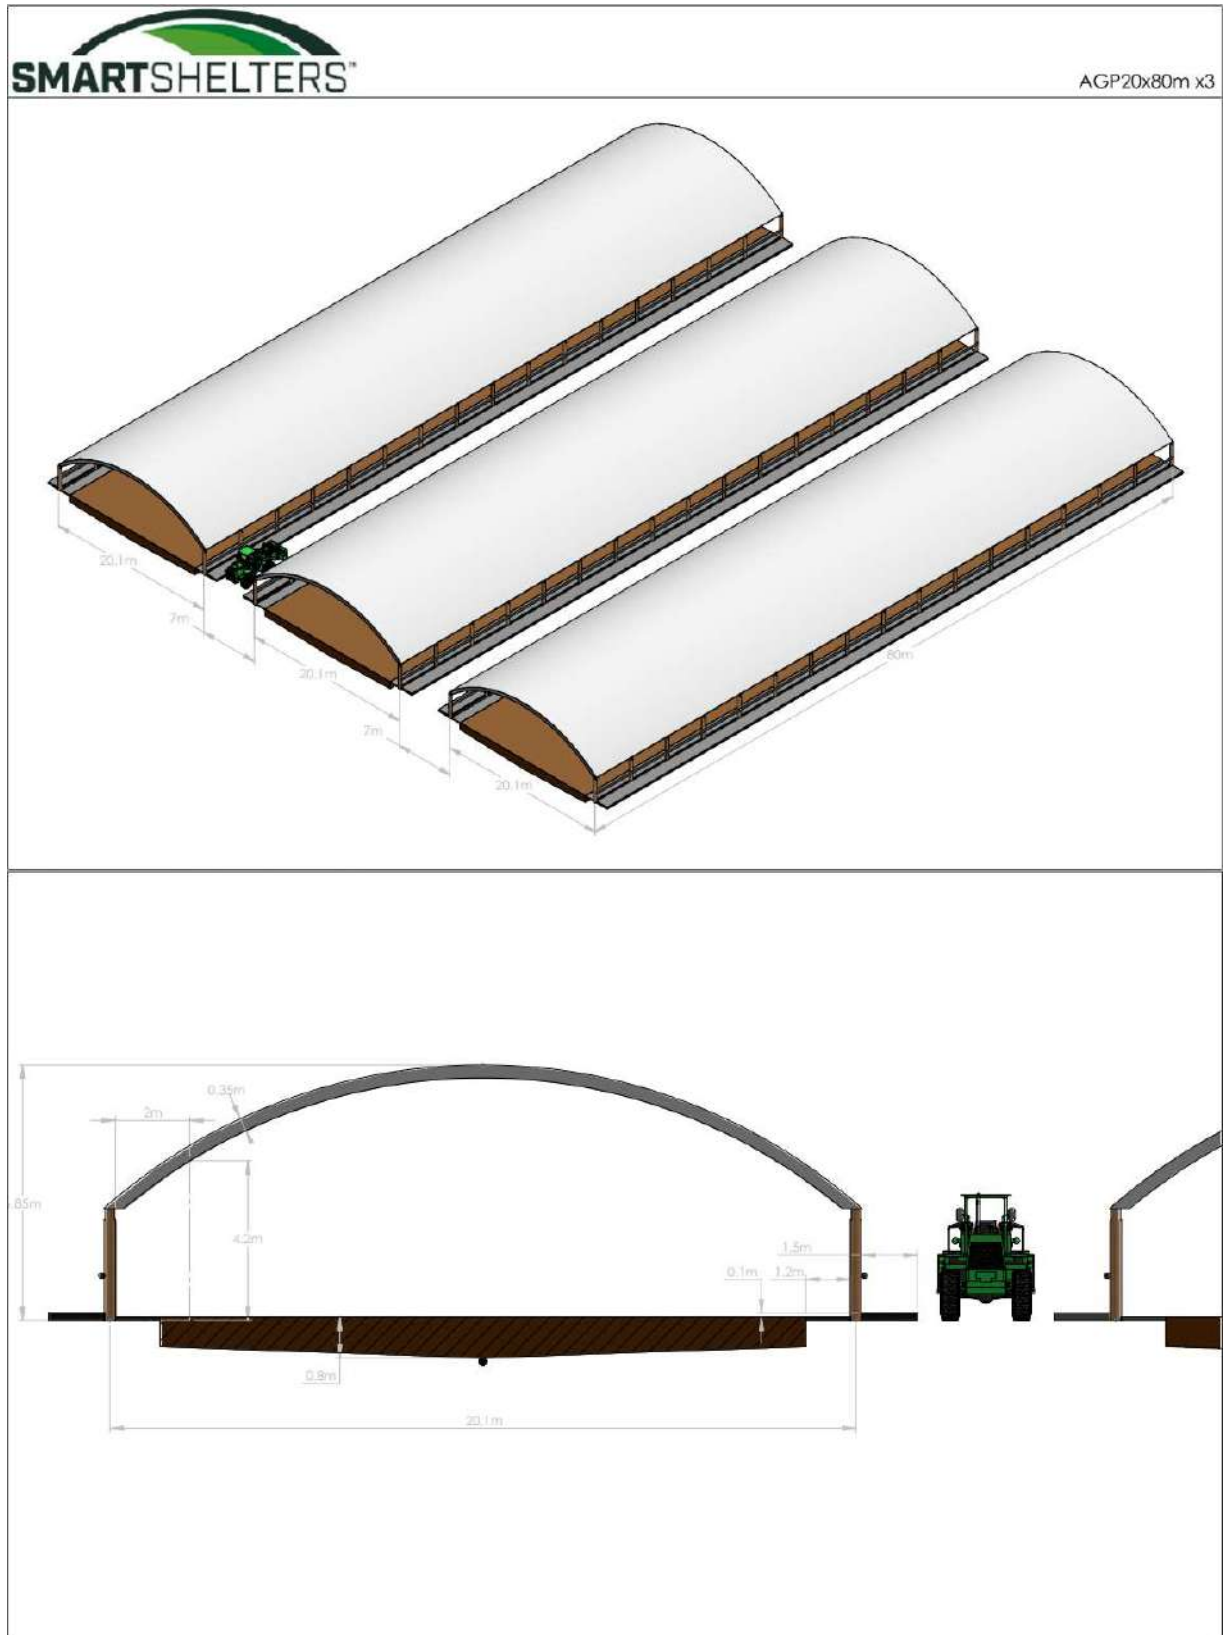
Tunnel roof (S2) concept plan including top and end elevation view. Concept plan provided by SmartShelters.
